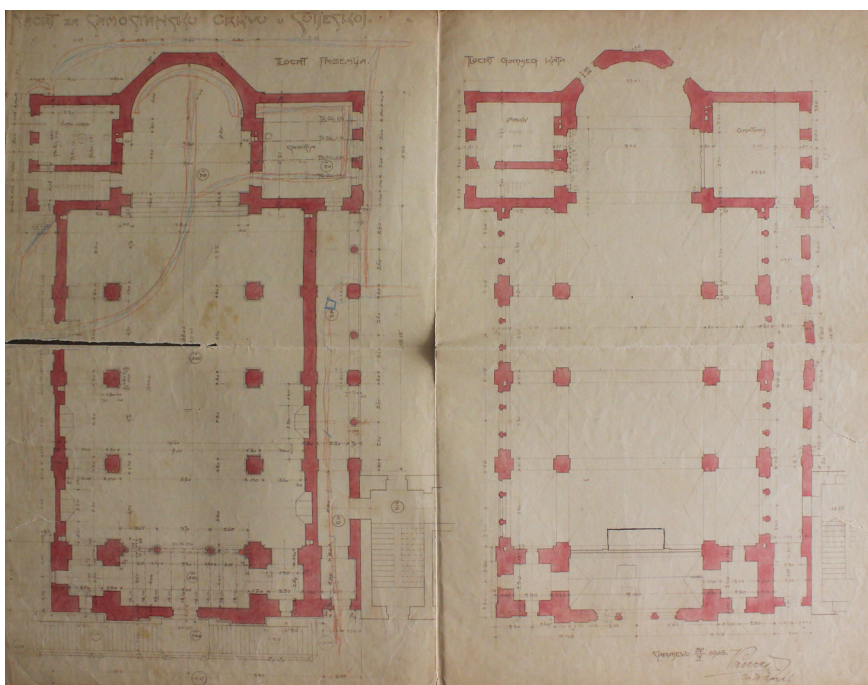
The Parish Church of Saint John the Baptist, Kraljeva Stujeska: ground floor plan with the ground floor plan of the Convent, a segment of the first project done by Josip Vancaš, dated on 9<sup>th</sup> September 1904<sup>33</sup>
